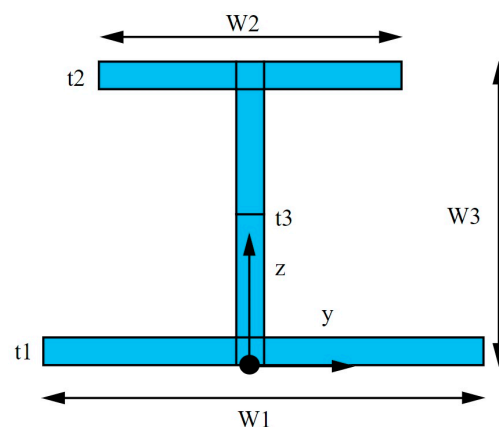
I cross-section geometry. W1, W2: width of the bottom and top flanges; W3: overall depth; t1, t2: thicknesses of the bottom and top flanges; t3: thickness of the web [42].
